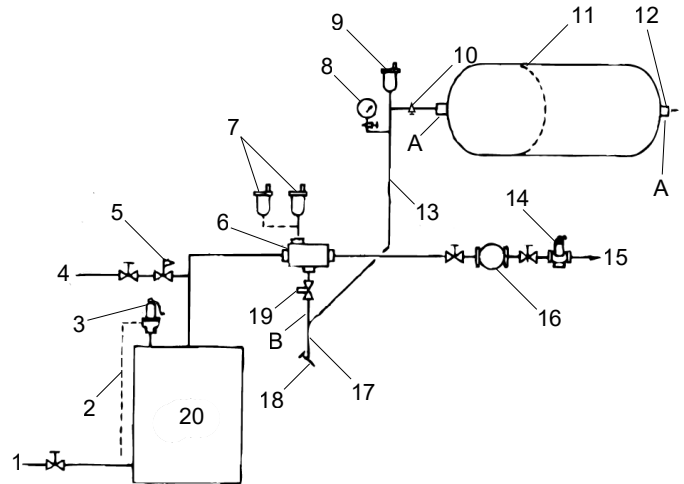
Typical Piping with IAF In-Line Air Separator and Airtrol Boiler Fitting
